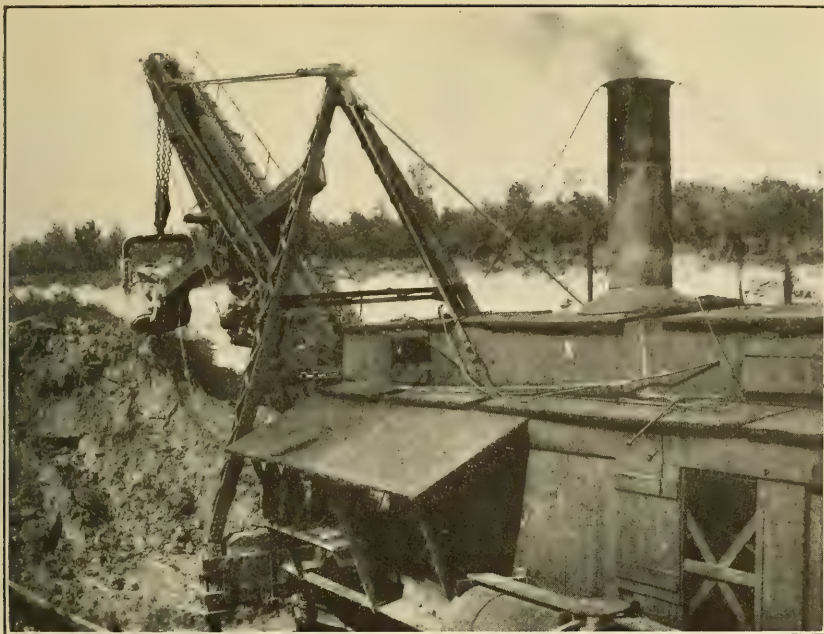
MACHINE MINING. REMOVING OVERBURDEN WITH STEAM SHOVEL.
